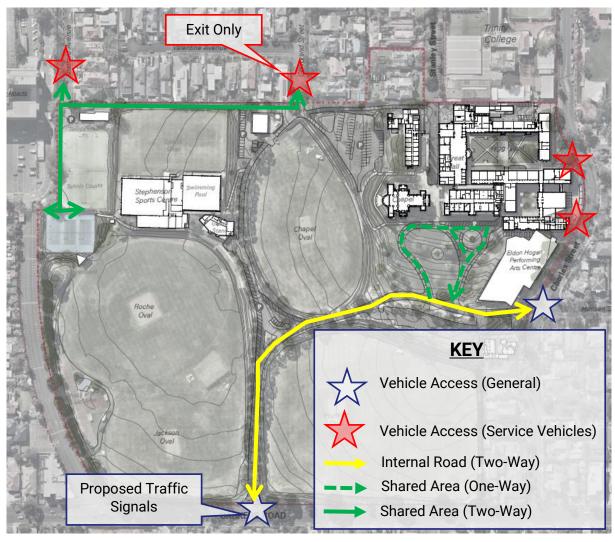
Vehicle Access Arrangements & Internal Road Network – Development Plan
